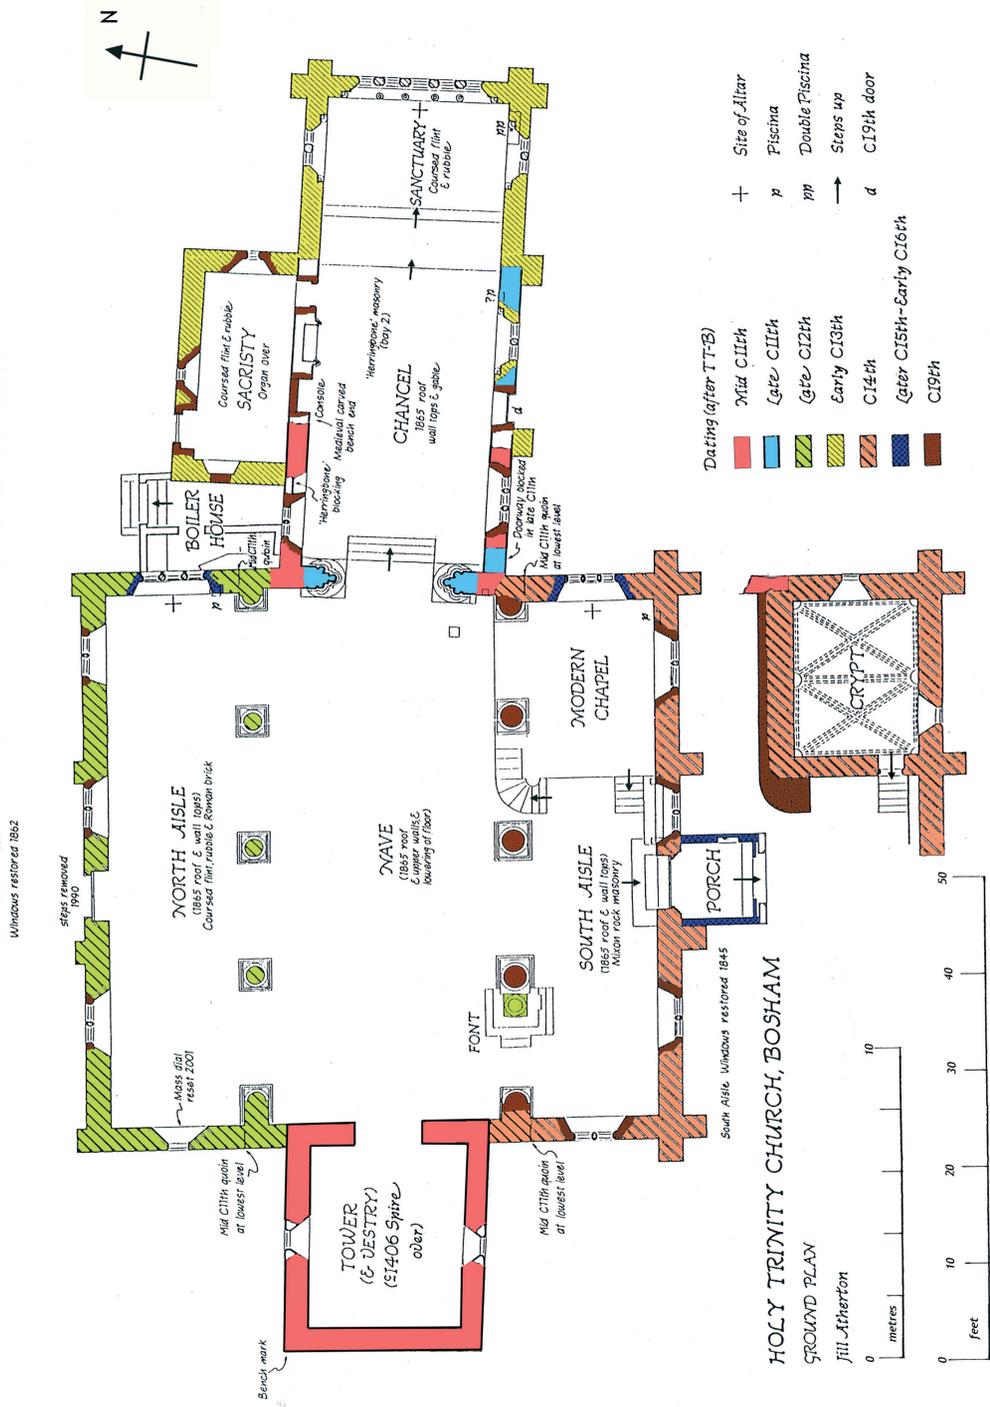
Holy Trinity Church, Bosham — ground plan.
